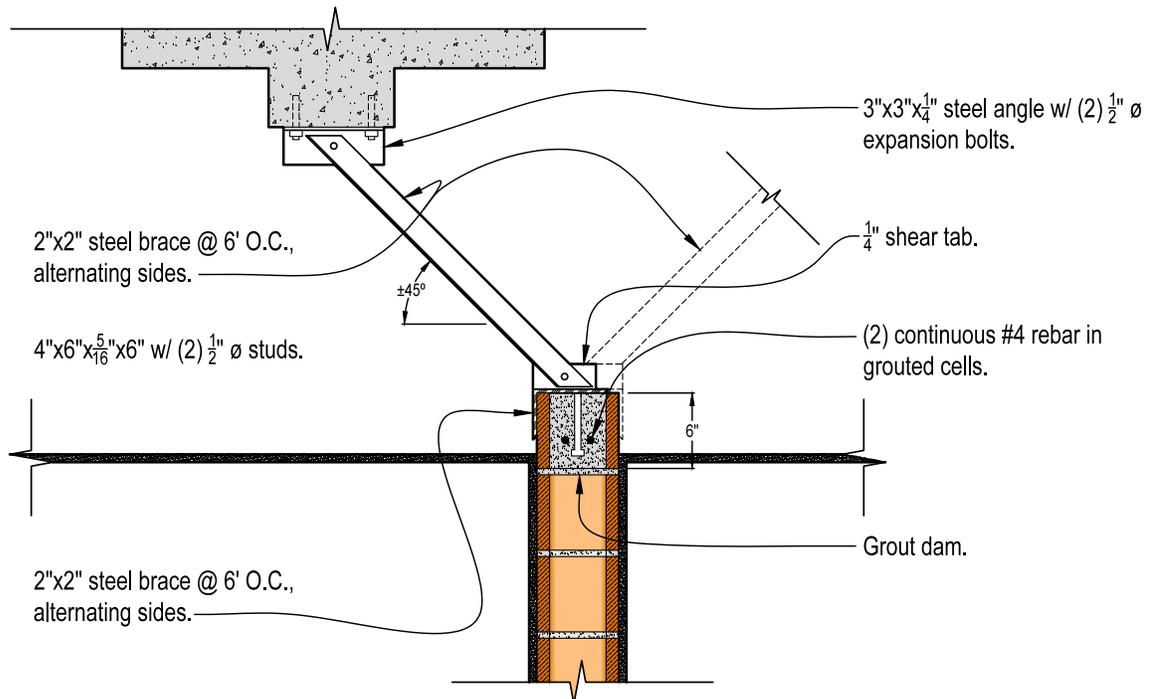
(1): Recommended Hollow Clay Tile Wall Top Bracing
